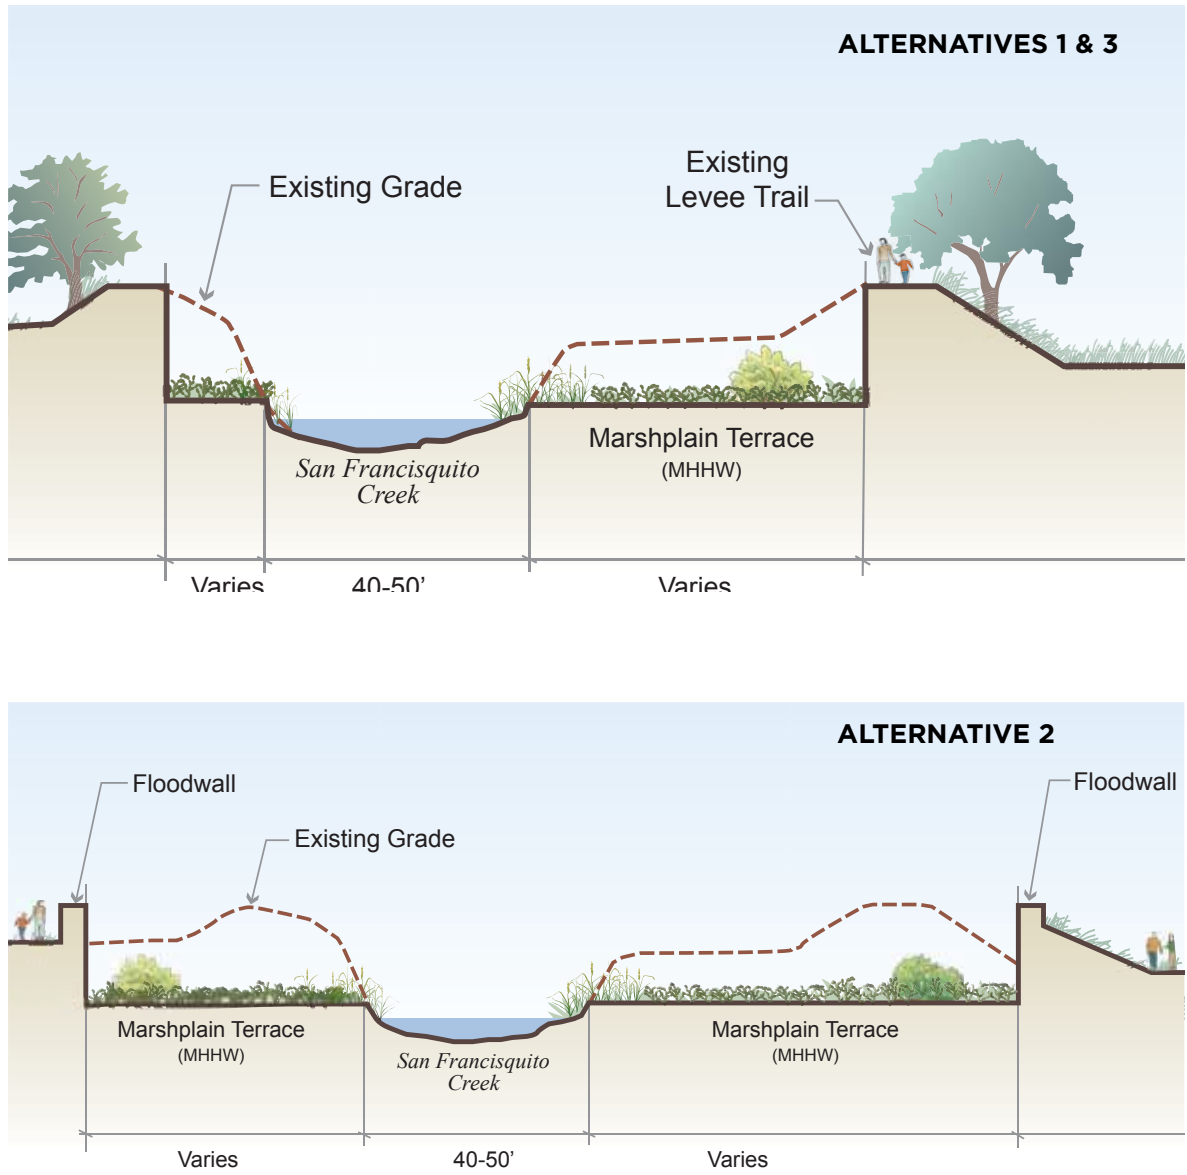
| CROSS SECTION A, VIEW LOOKING DOWNTREAM
